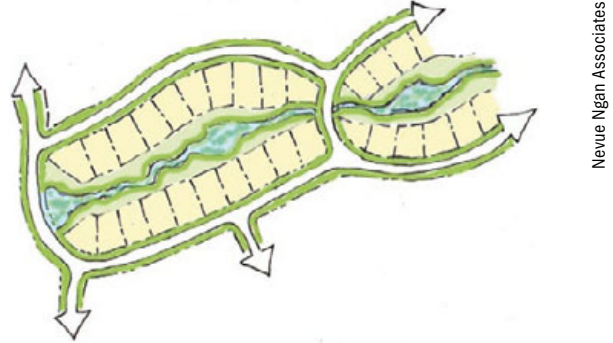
A redesigned site plan with a well-connected stormwater system. Rainfall is collected and conveyed through interconnected rain gardens, creating a more natural condition while still allowing development to occur.
